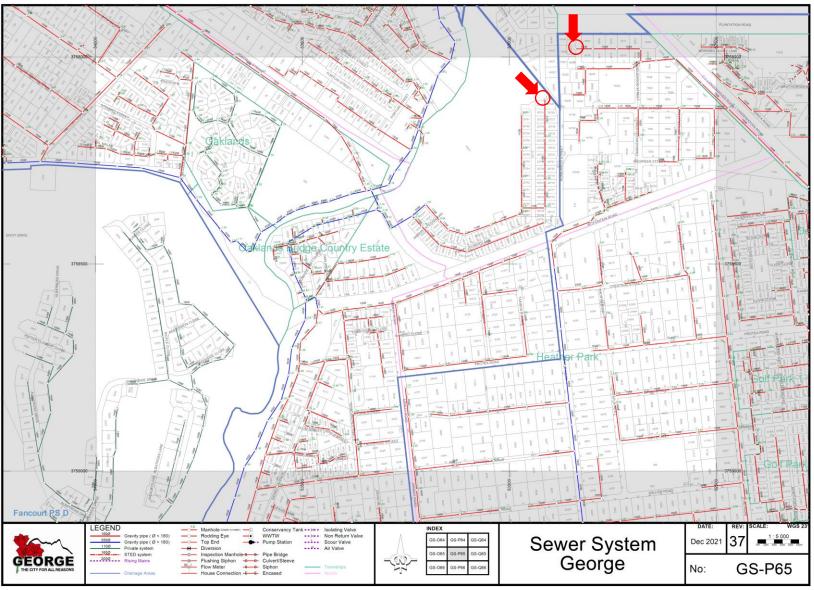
Proposed Sewer Connection Points – as pointed out by GLS Consulting Engineers.
